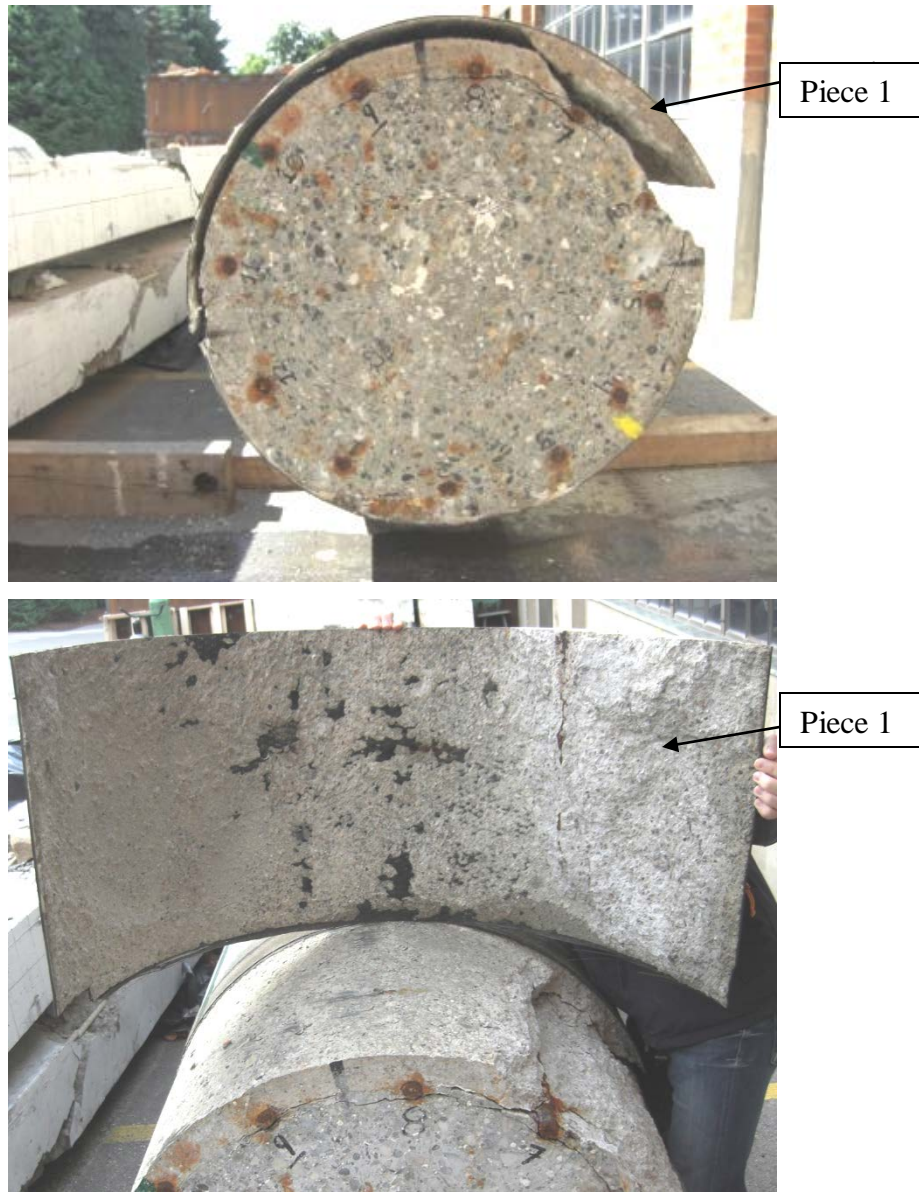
CFRP Jacket-concrete bond – Piece 1 removed from column
